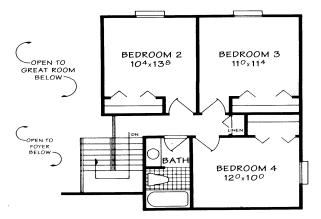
The Princeton Home, Floor Plan, 2nd Floor
